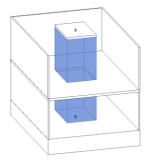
REVIT BIM MODEL – ATRIUM SPACE AS SHAFT OPENING WITH ROOF AND FLOOR AS TWO ELEMENTS – 3D VIEW
